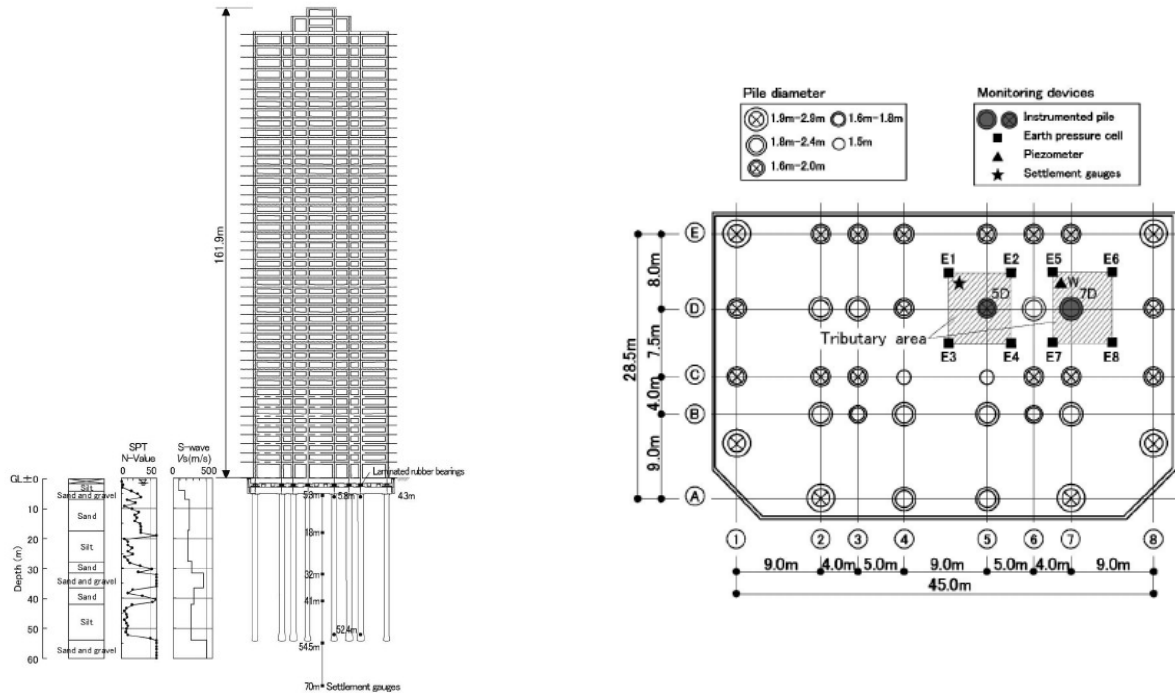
The soil profile and the foundation plan of 47 story residential tower, adapted from Yamashita et al. (2011)
